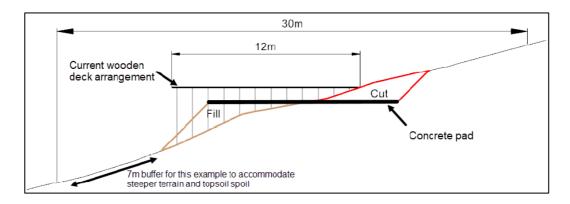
Current Wooden Deck Arrangement Verses Proposed Concrete Pad Arrangement
